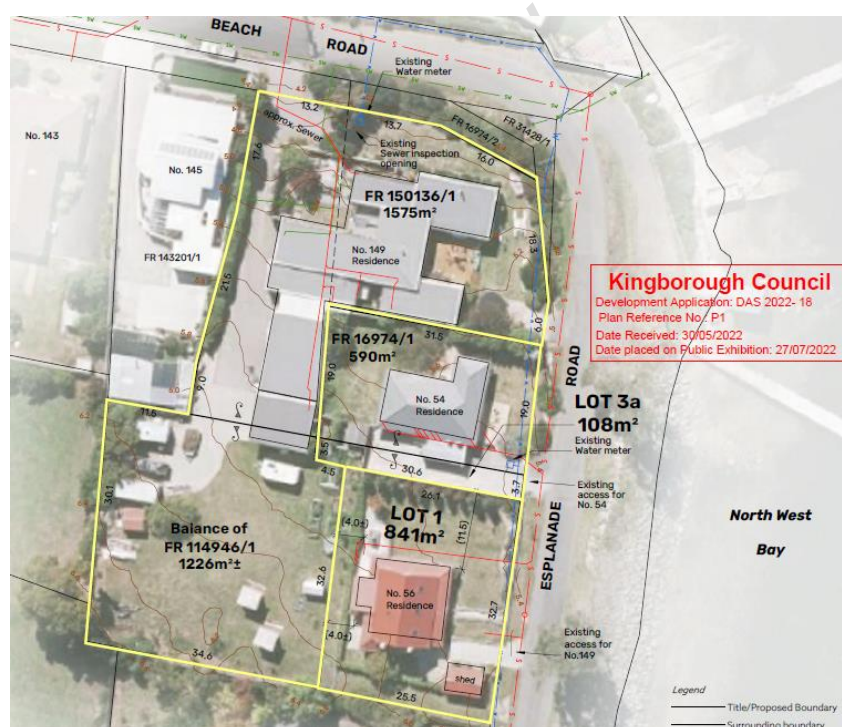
Proposed Subdivision Plan (refer to Figure 2 for plan of existing layout)
